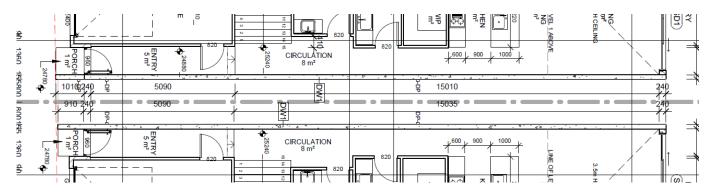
Extract of the architectural plans (Floor Plans) showing the proposed hallway located 800mm from the common lot boundary
